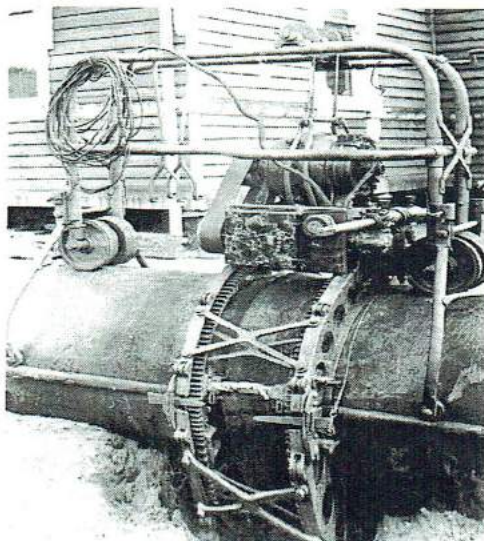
The caulking machine (courtesy Battye Library 3174P)
